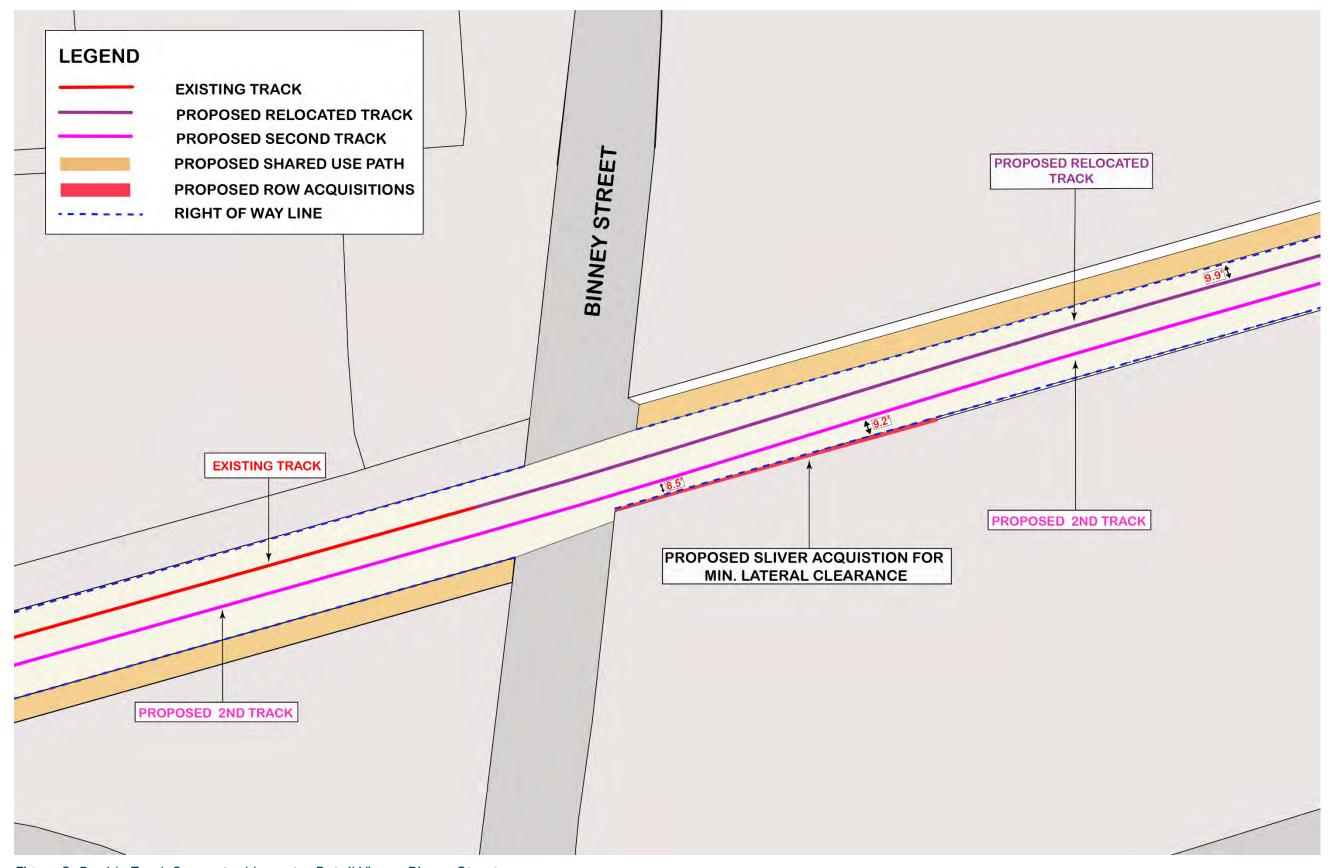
Double-Track Conceptual Layout – Detail View – Binney Street
